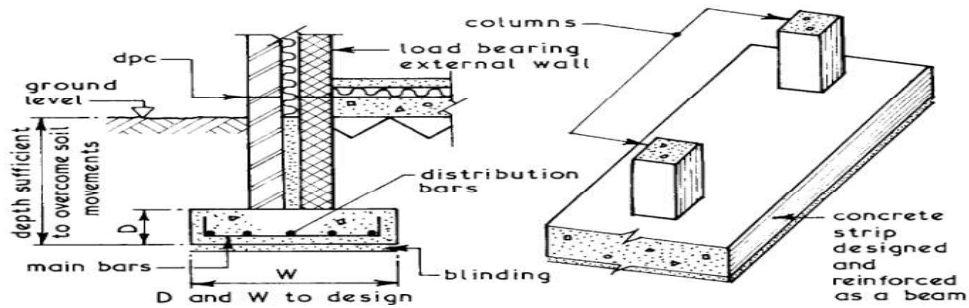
Strip foundation; Source : Chudley & Greeno, 2014.
